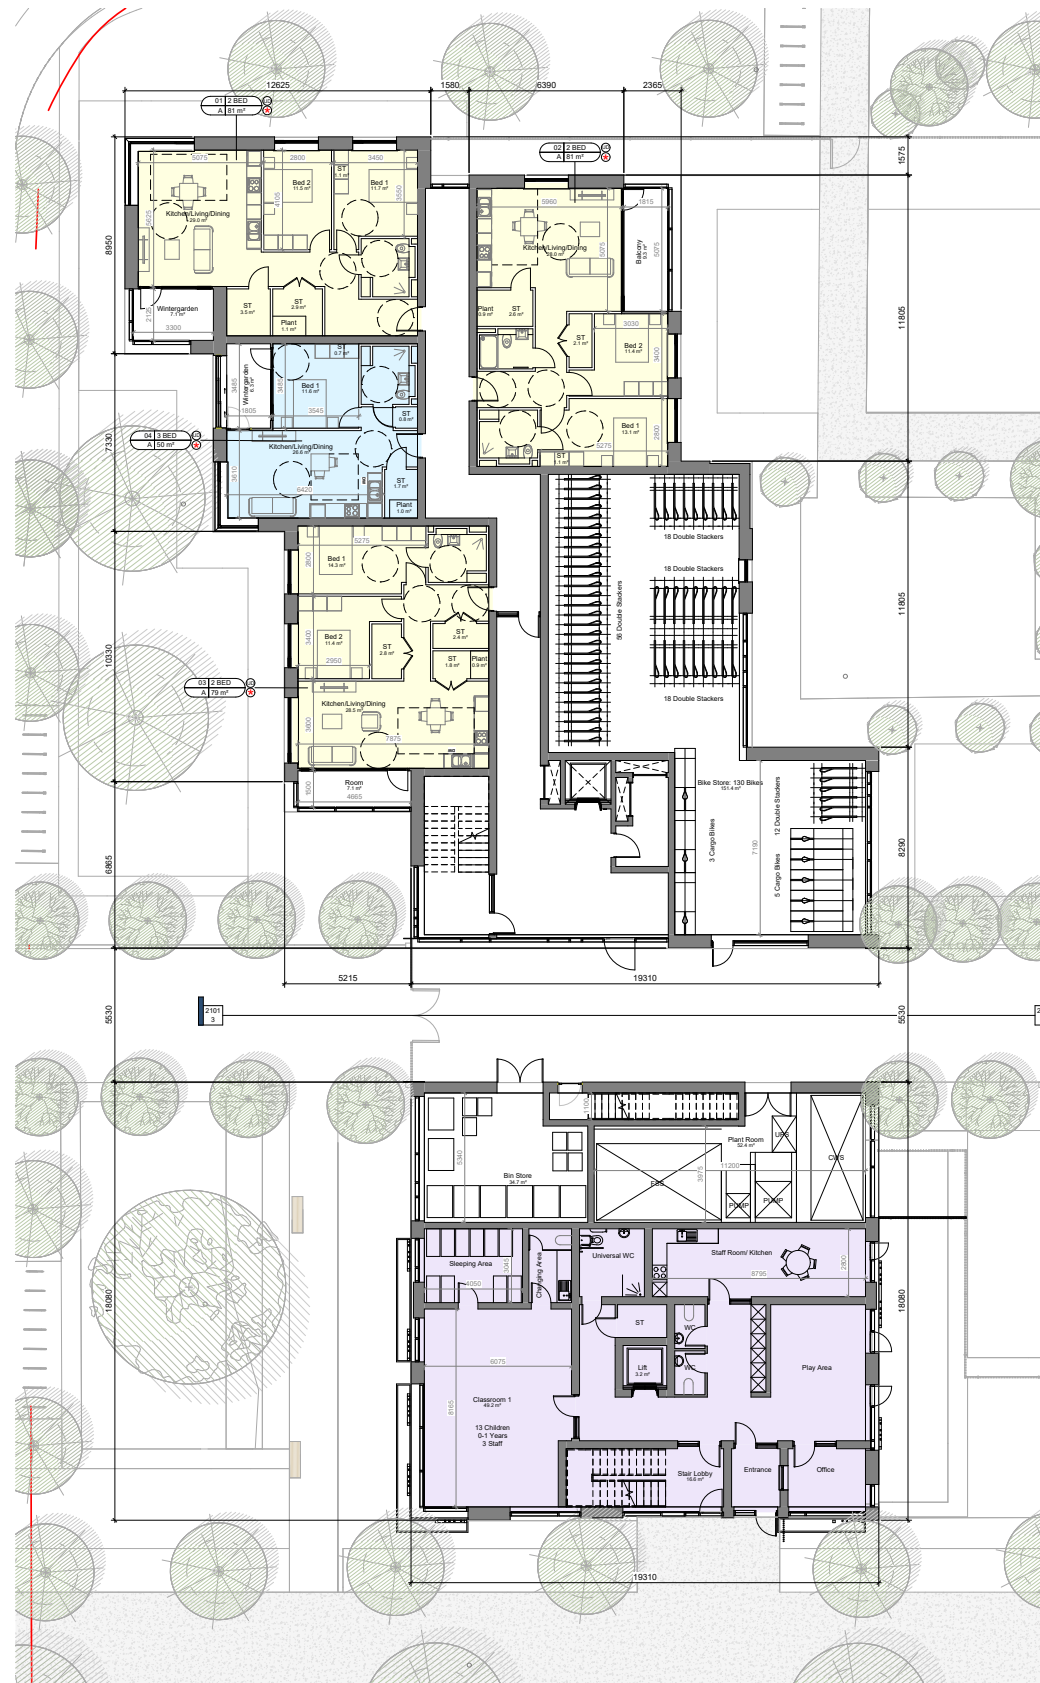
Block A - Ground Floor Plan Source: MCORM, 2026.
